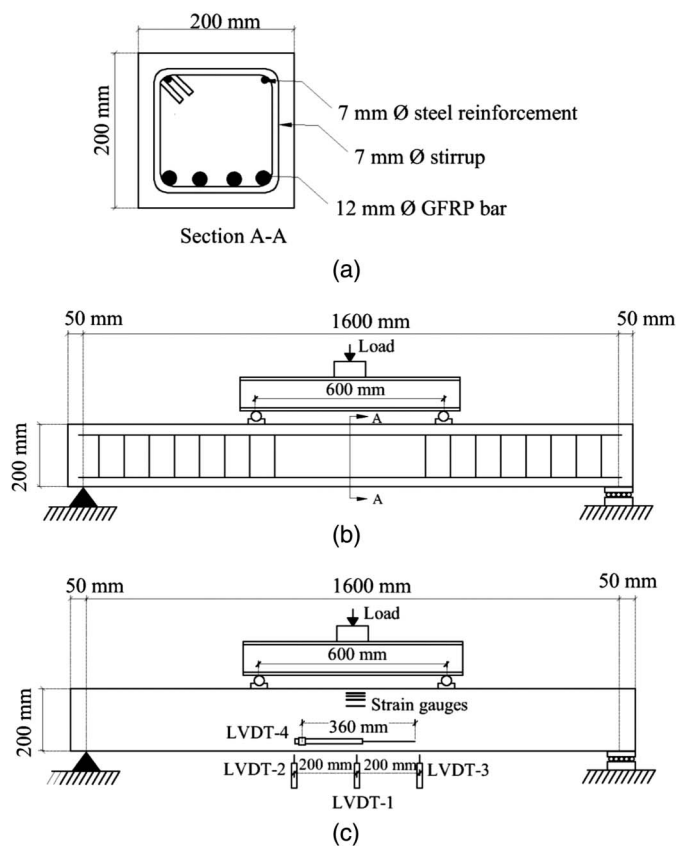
Details of beam specimen and test setup: (a) details of beam cross section; (b) details of the beam specimen; and (c) test setup.
